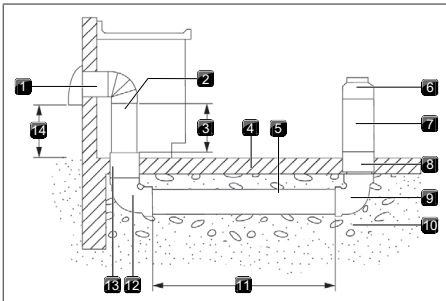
Concrete Slab Installations - Exhaust Through Wall
